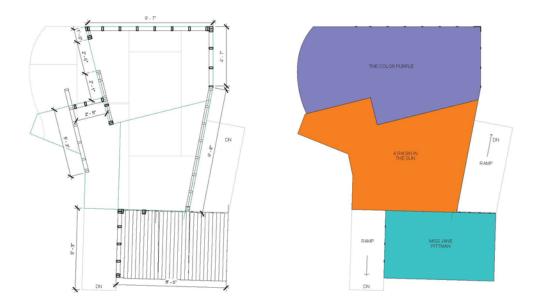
Installation Construction Plan and Spatial Arrangement Diagram
